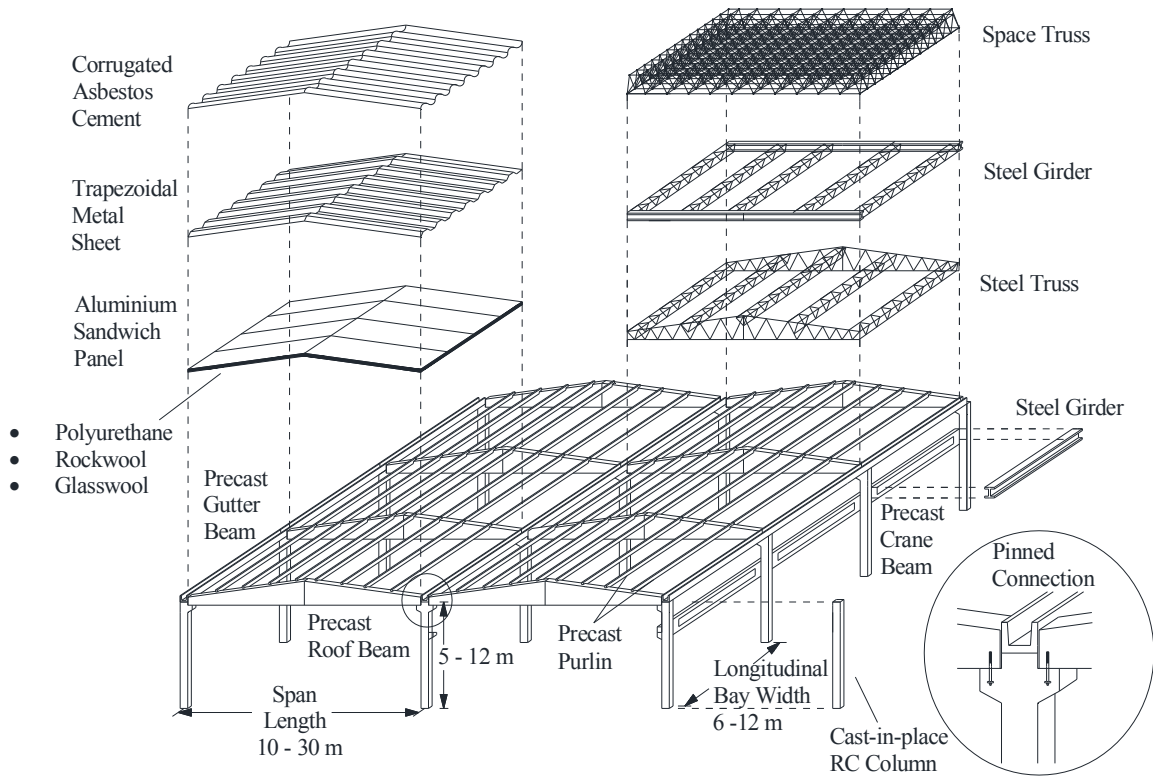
Typical single-storey reinforced concrete industrial building in Turkey.
